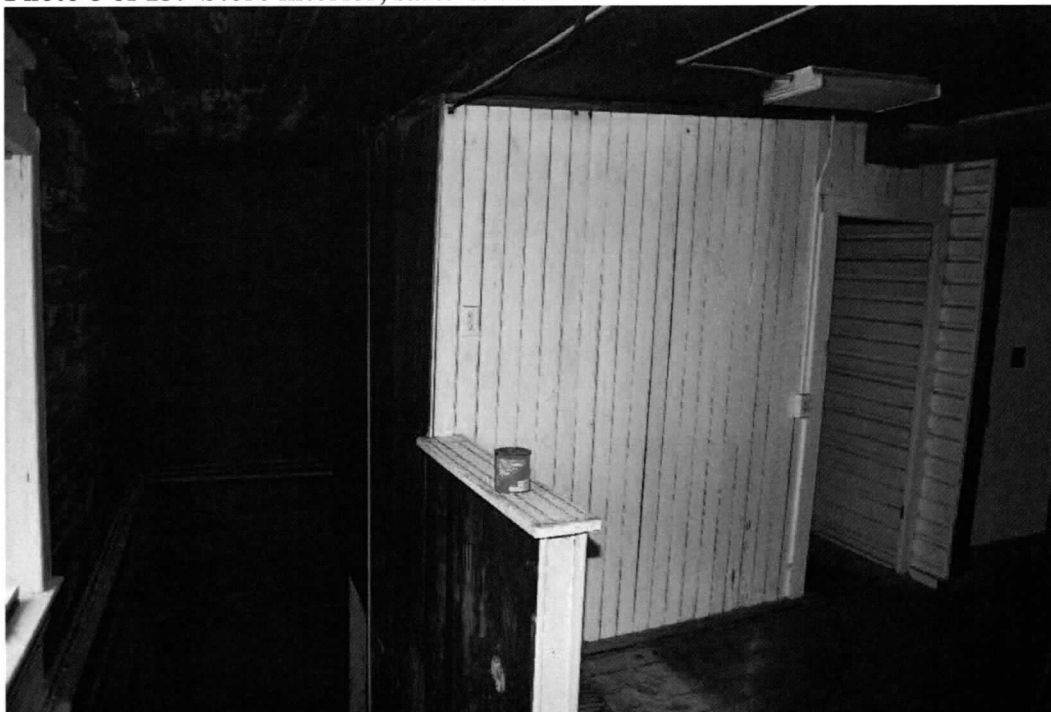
of 13: Store interior, second story, north room, view east to stairs. 5/22/2020
